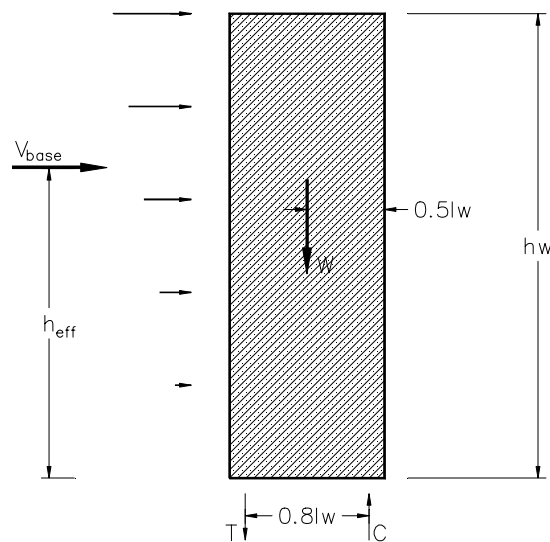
Model to Estimate Wall Longitudinal Reinforcement
